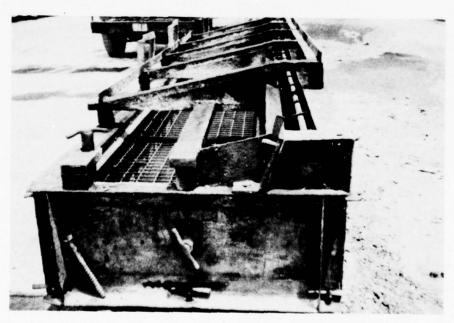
Exterior reinforced concrete girder immediately prior to casting
